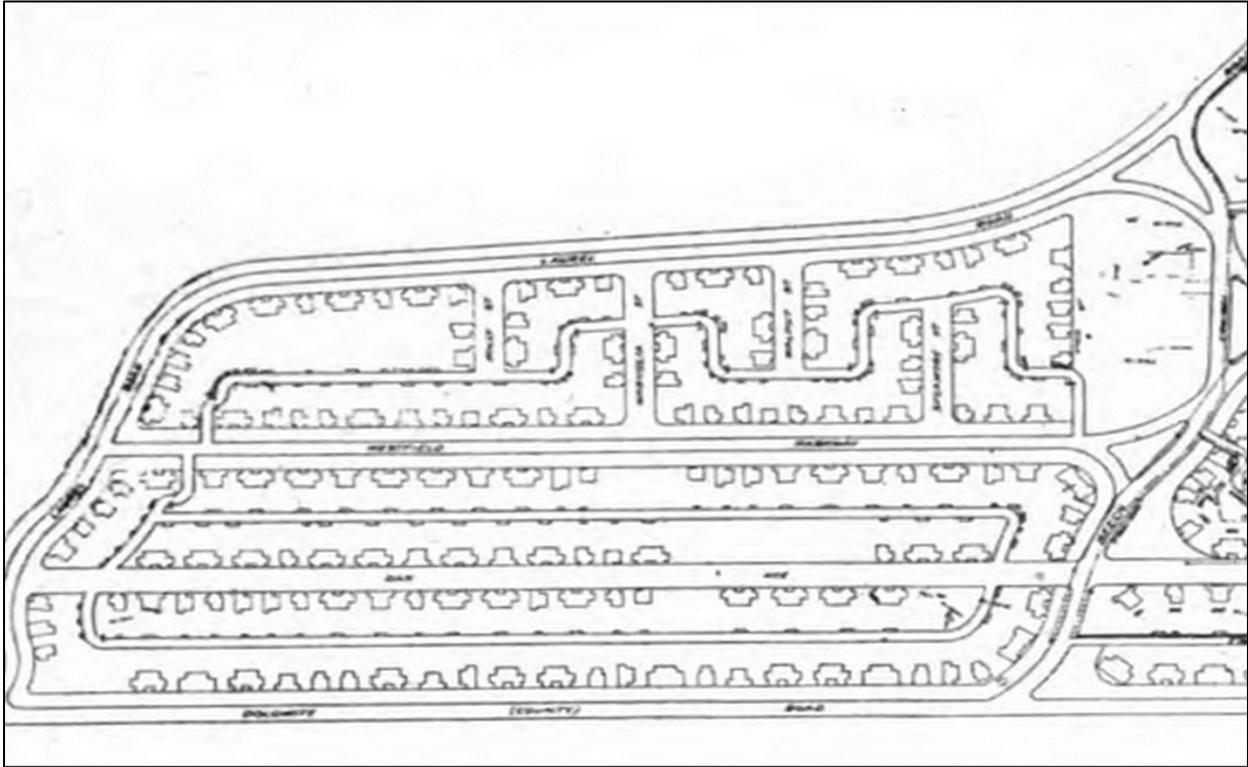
Detail of Westfield, Alabama site plan showing sidewalks between houses. *Source:* USS 1918, 77.
